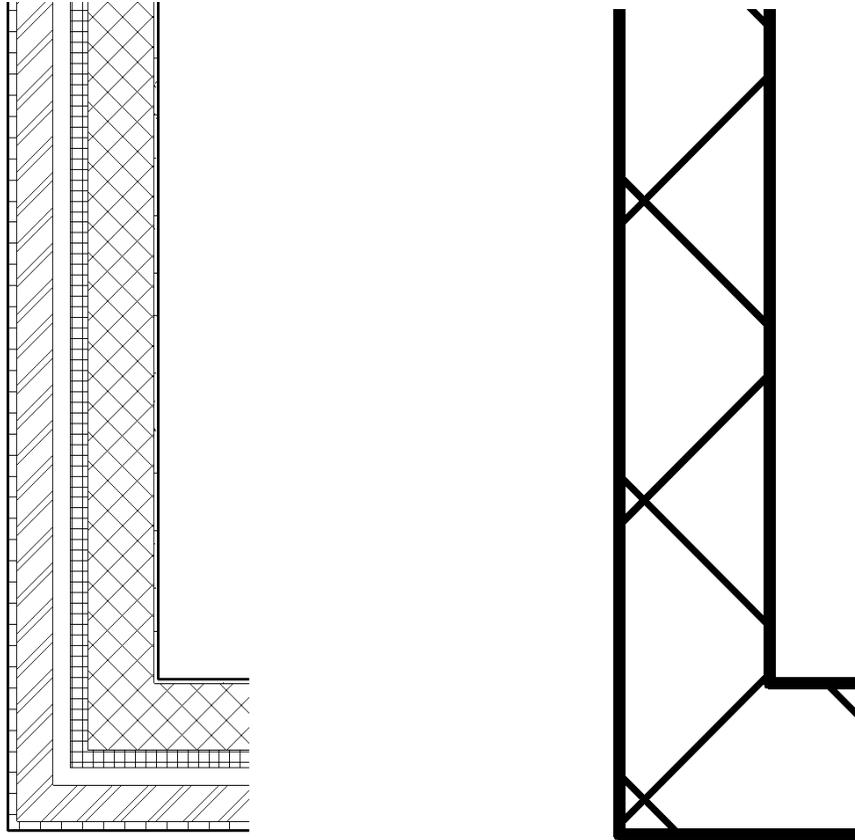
Display of the same wall in a BIM floor plan, under settings 1:20 and fine (left), and 1:200 and coarse (right)
